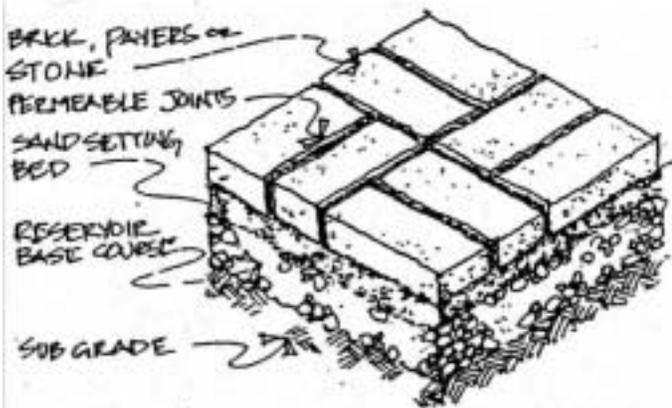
Green Streets Solutions - Permeable Pavement
